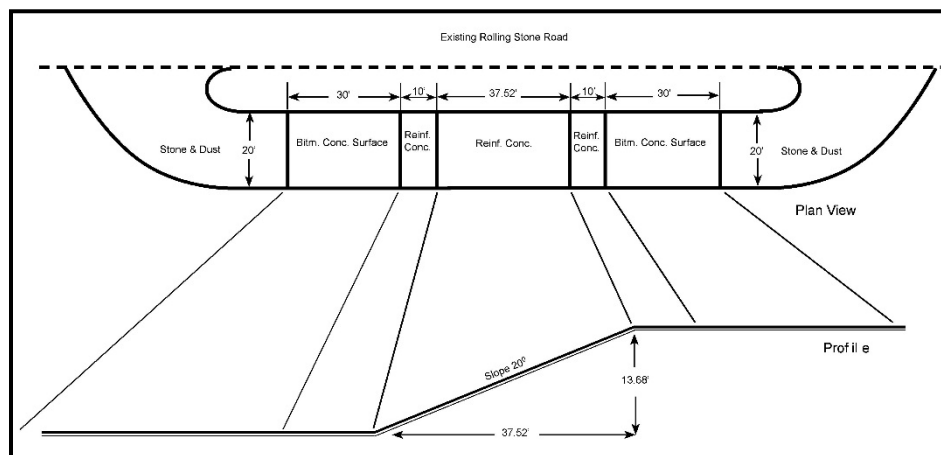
Plan view and section of 20-degree simulated loading ramp.
